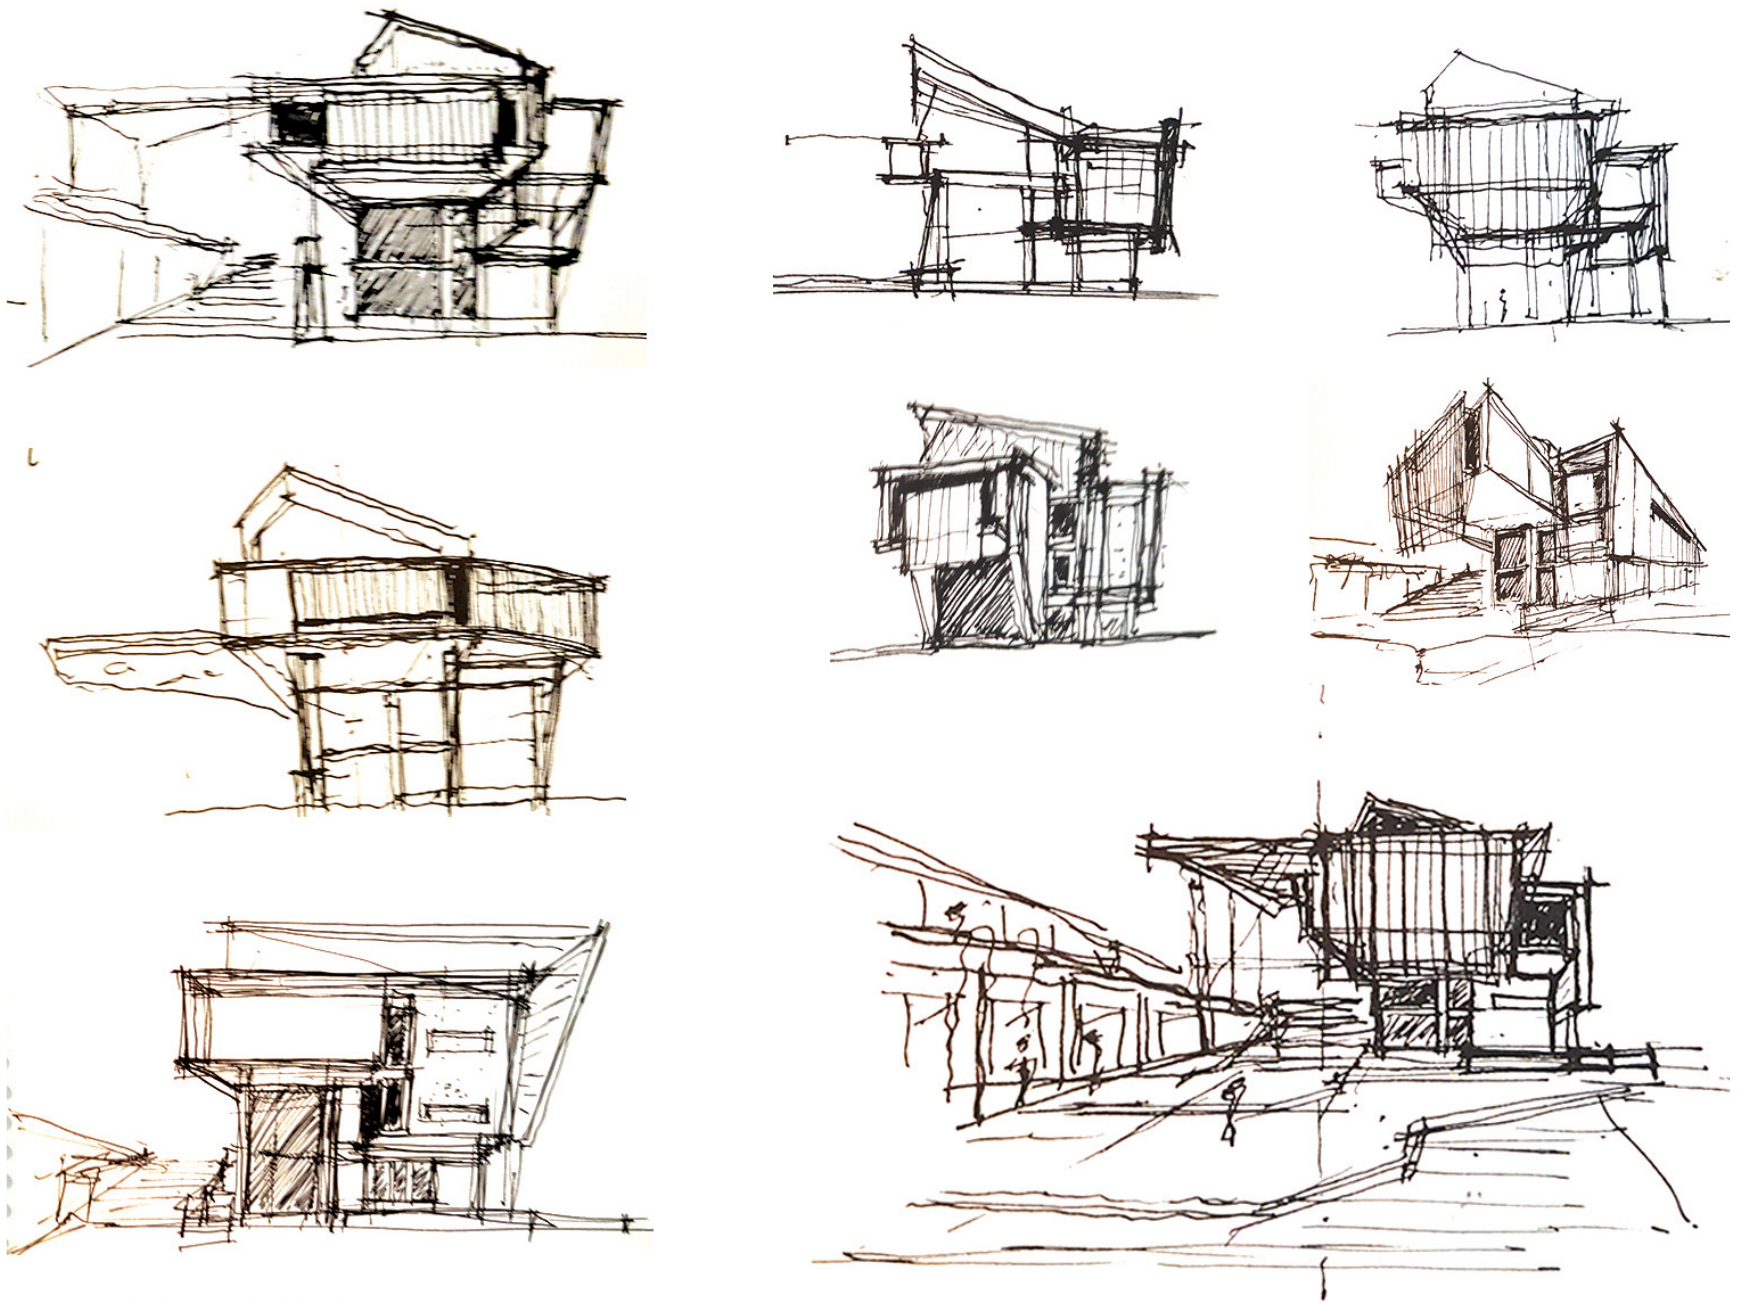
East Elevation development, building fronting new plaza (Author, 2019)
